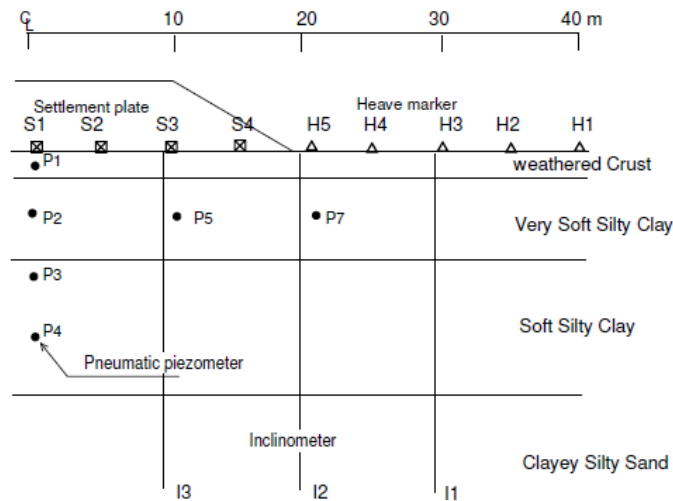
Cross section of the Muar embankment with monitoring equipment
